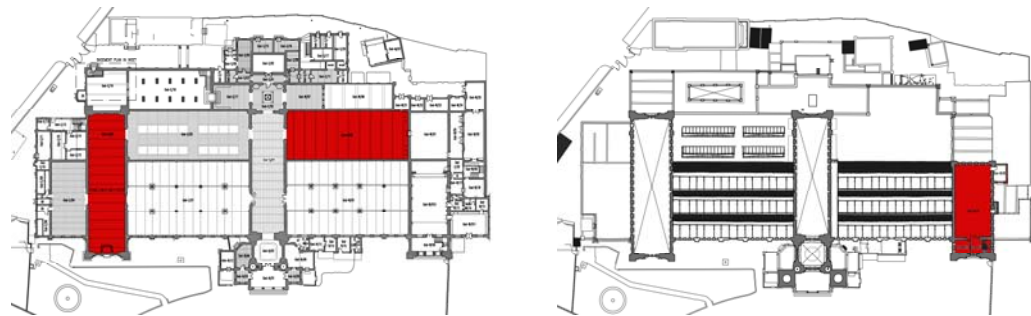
Lahore Museum key plans showing locations of I-Beams supporting RC Slabs
